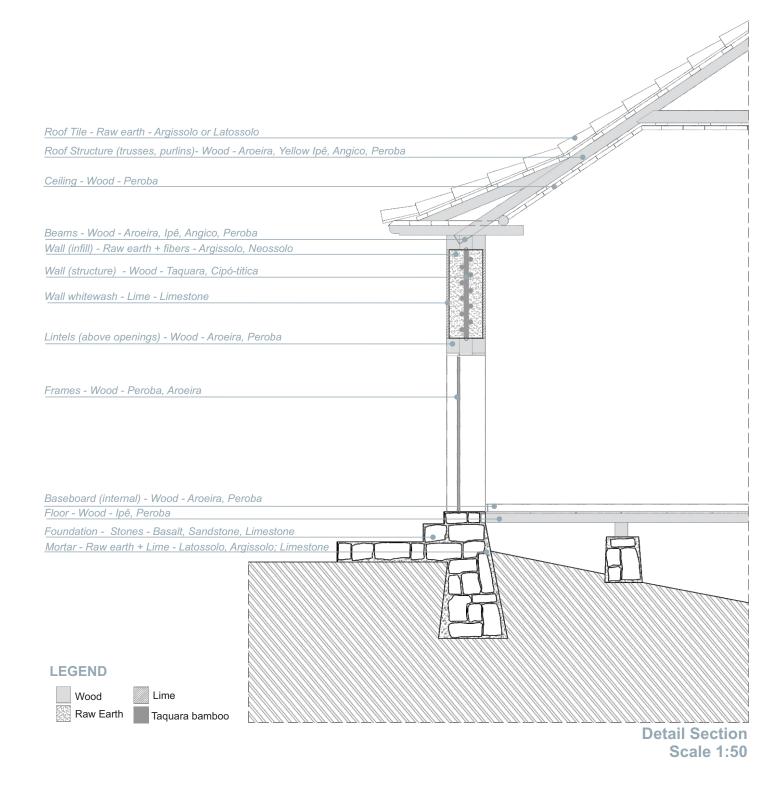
Section of a typical 18th-century colonial house in the Midwest
